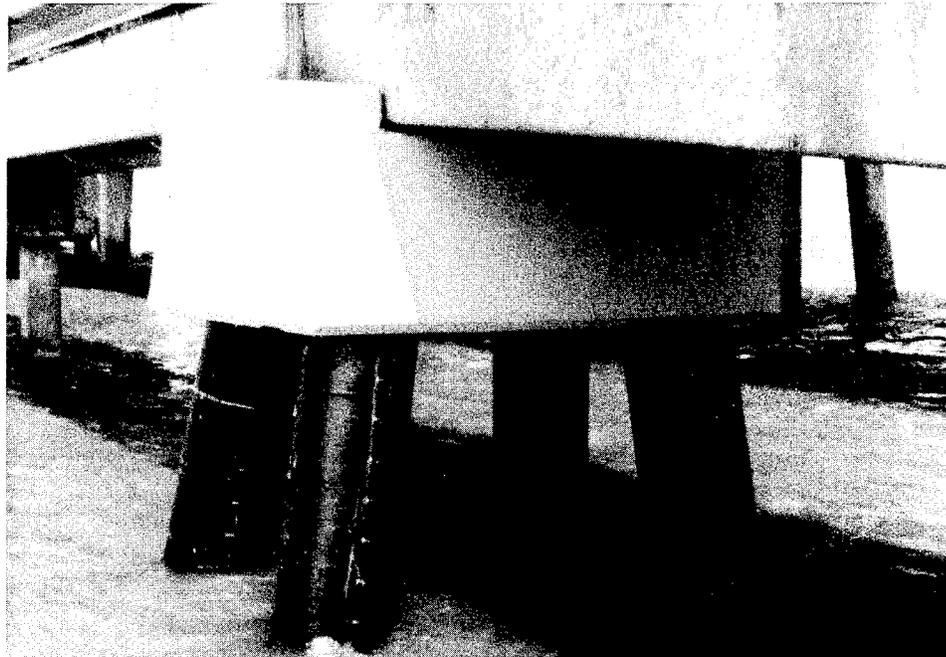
Completed zinc/hydrogel system installed on pilings and pile cap.
